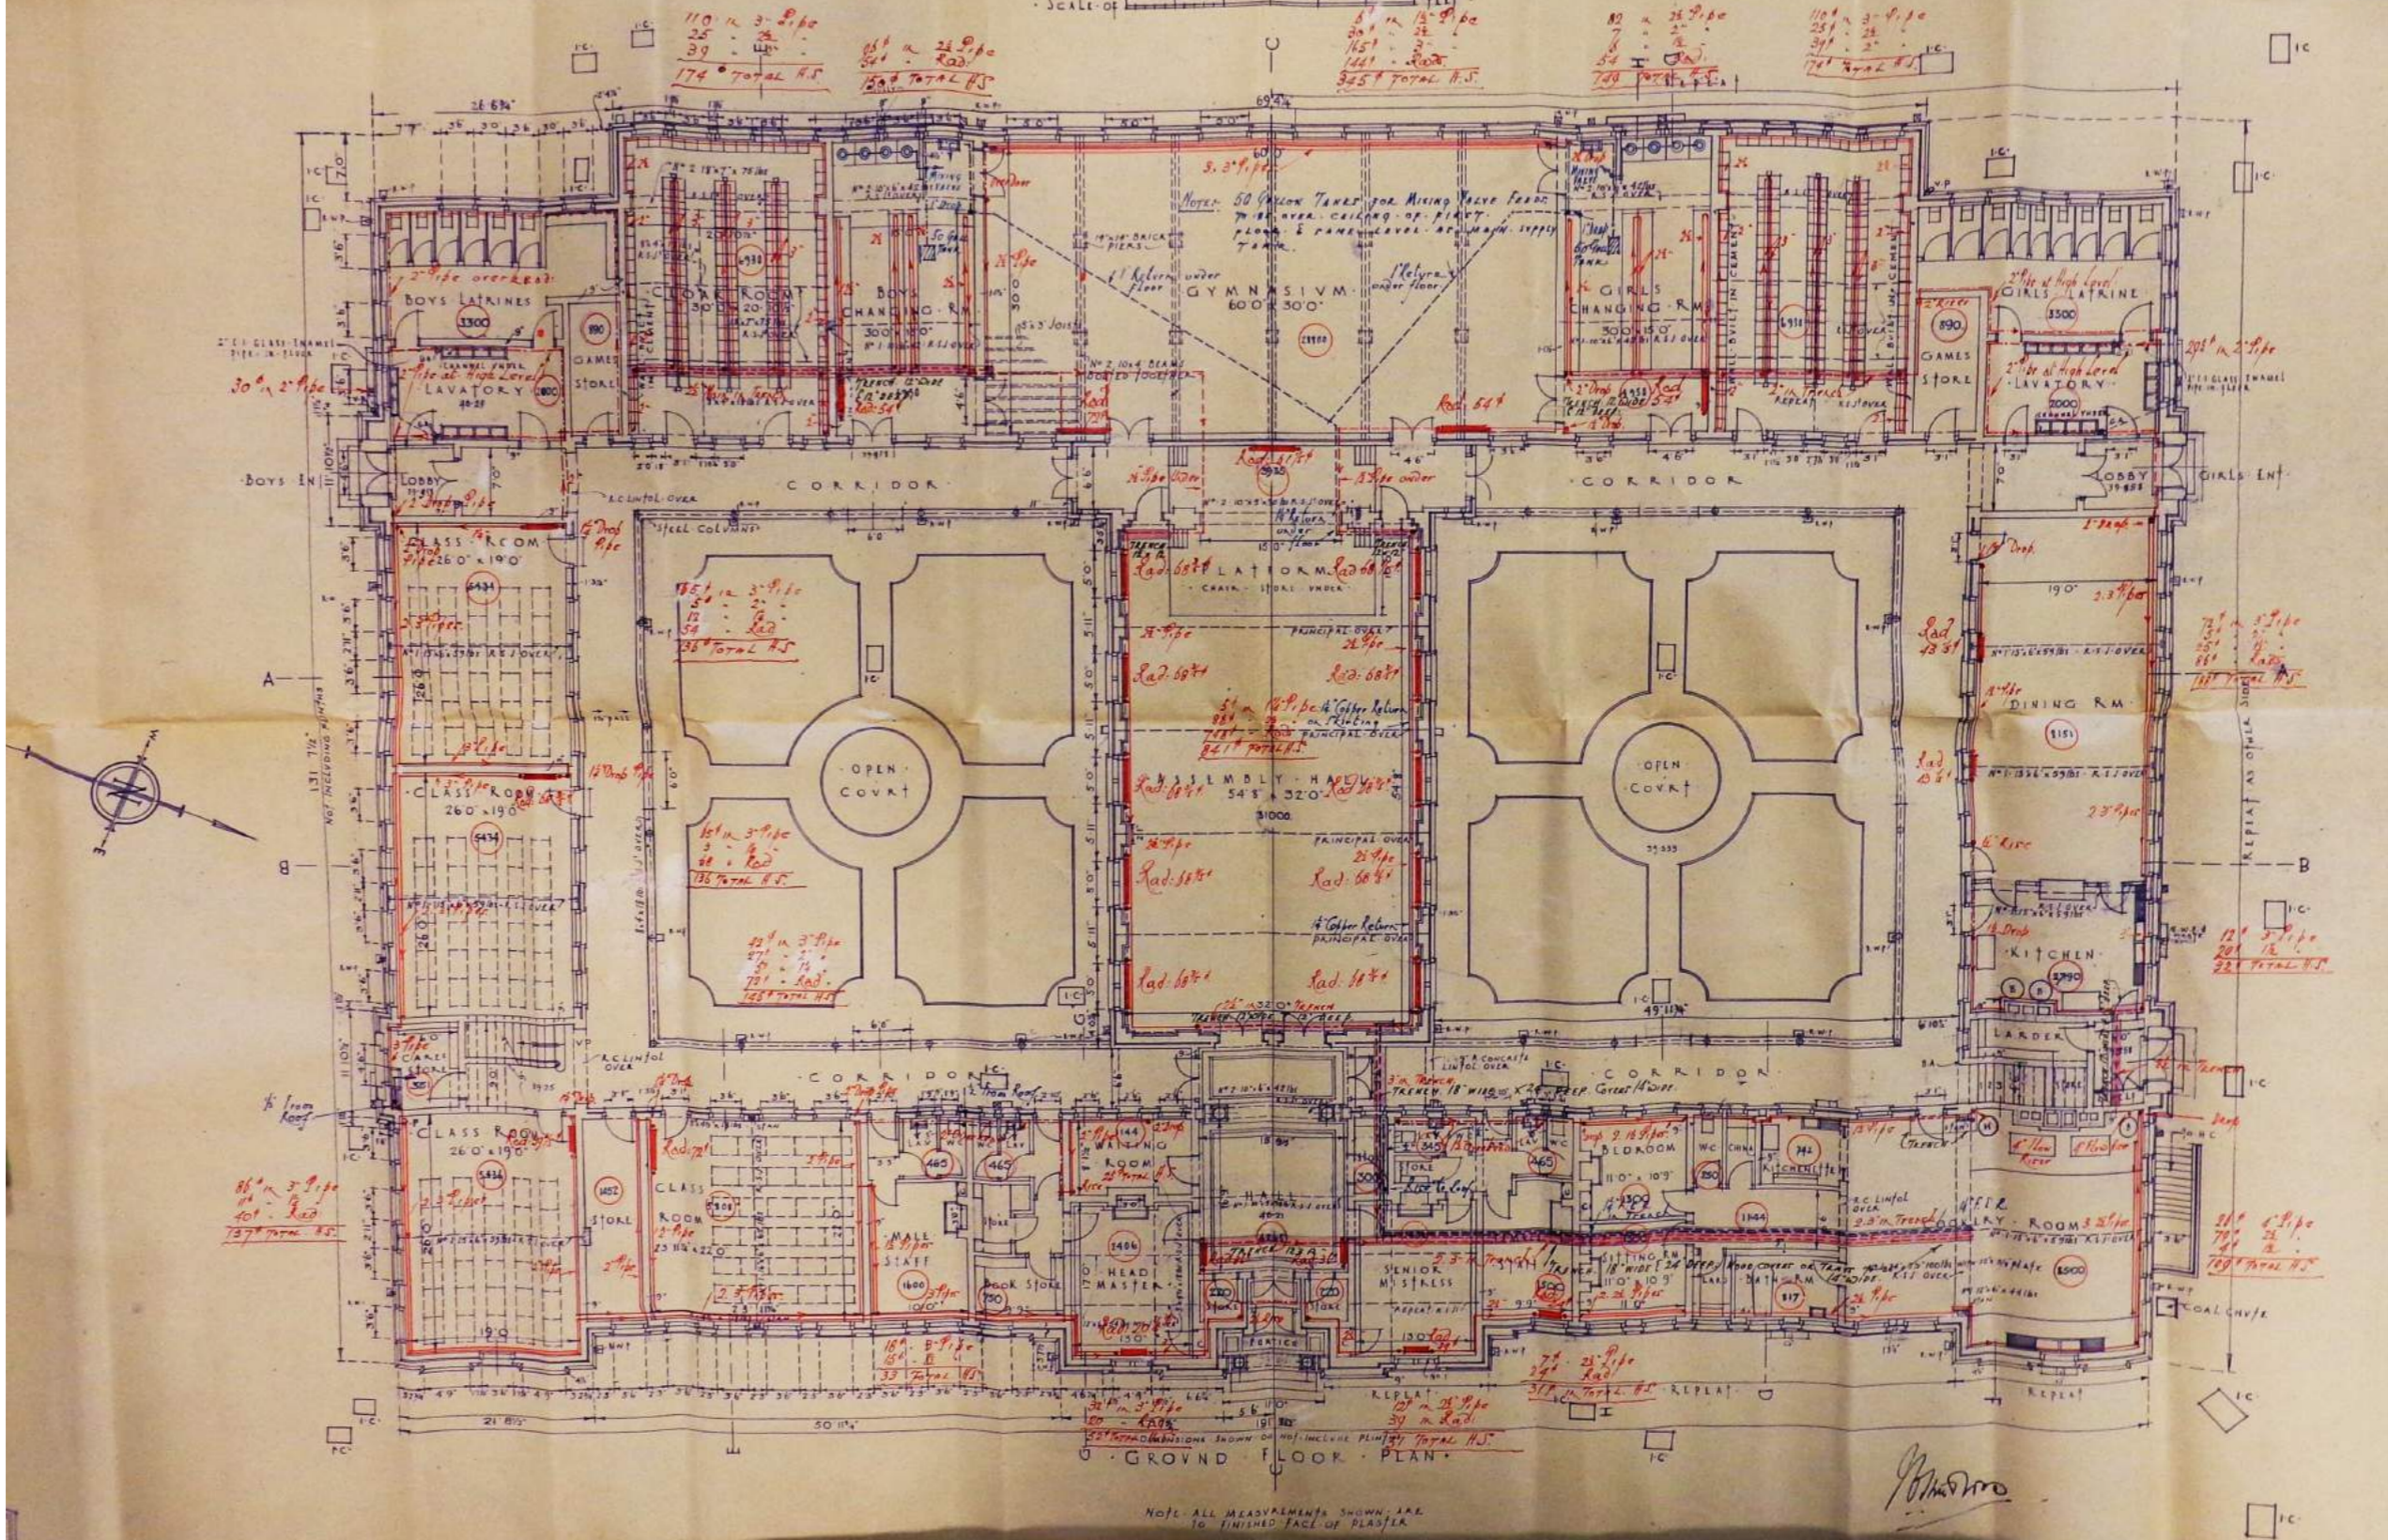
Original plan from 1932 of Tonyrefail Secondary School Ground Floor, for installation of hot water heating.
